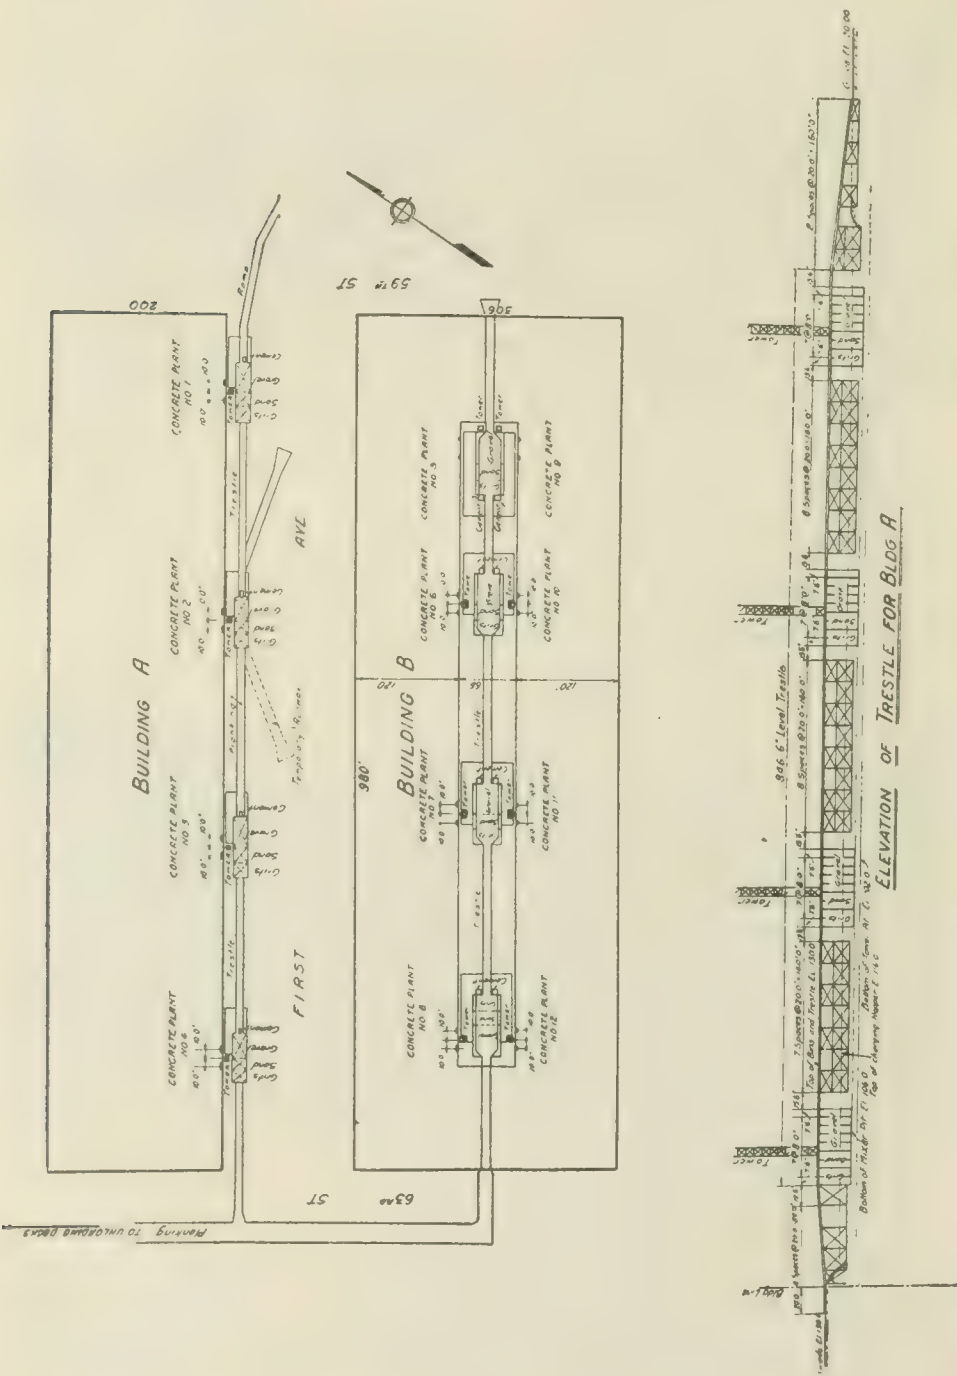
PLAN SHOWING TRESTLE AND ROUTE OF MATERIAL TRUCKS; ALSO ELEVATION OF TRESTLE.
